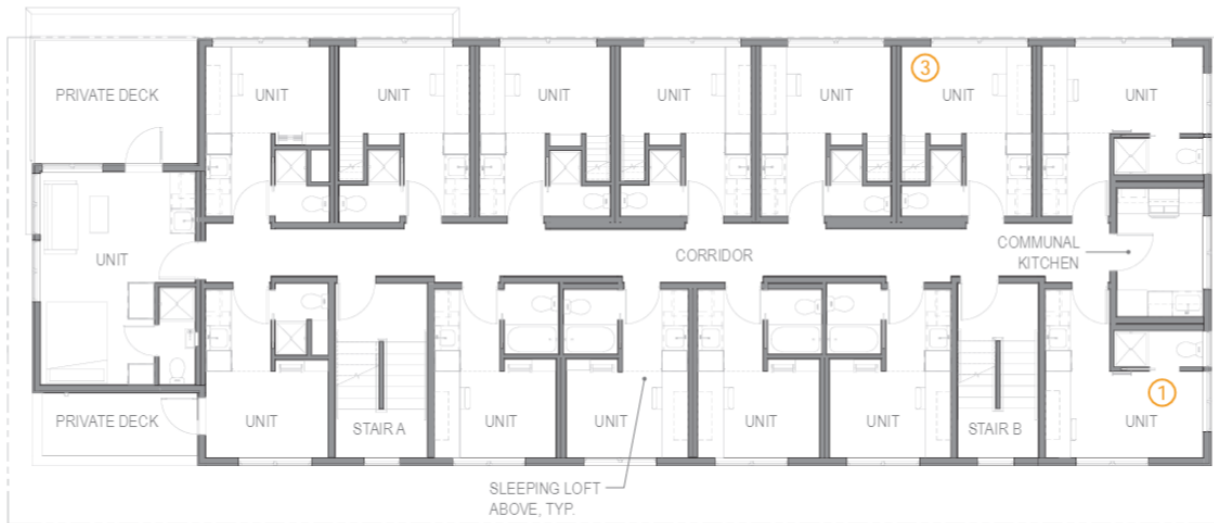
The Roost building. Upper level floor plan. Credit Neiman Taber Architects.
